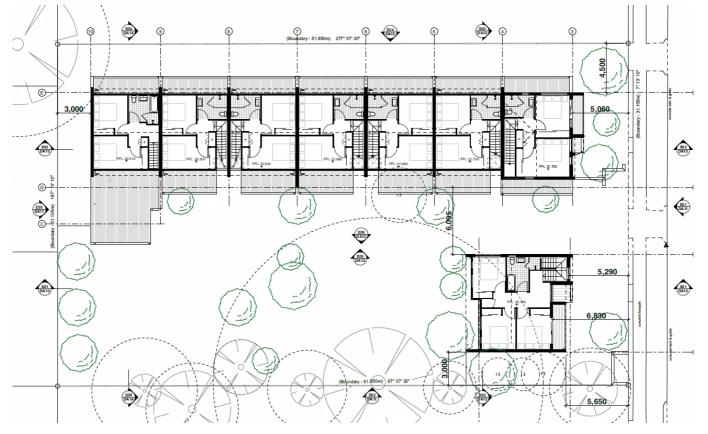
Extract from Architectural Plans (first floor) (Source - Stanton Dahl Architects, dated 19/02/2024)
